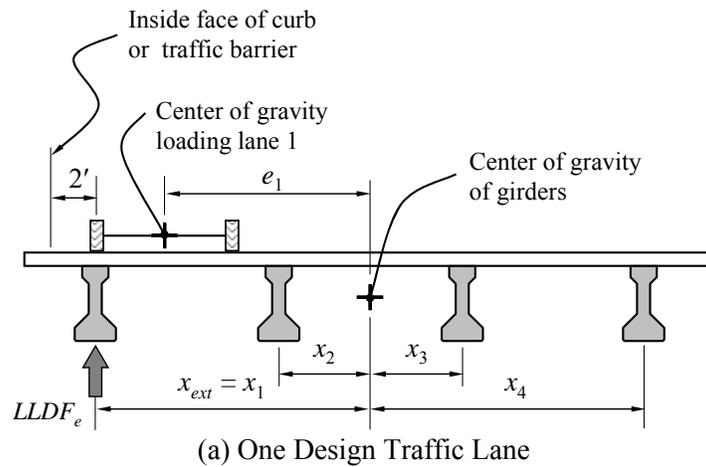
Rigid Body Analysis of Prestressed Concrete Girder Bridge with Diaphragms
